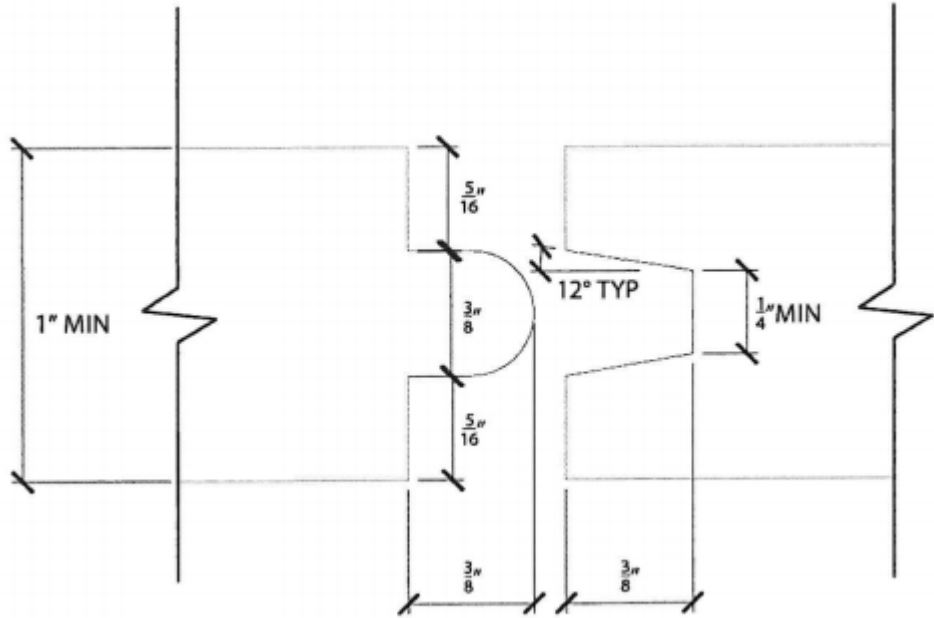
TYPICAL WALL CONSTRUCTION
